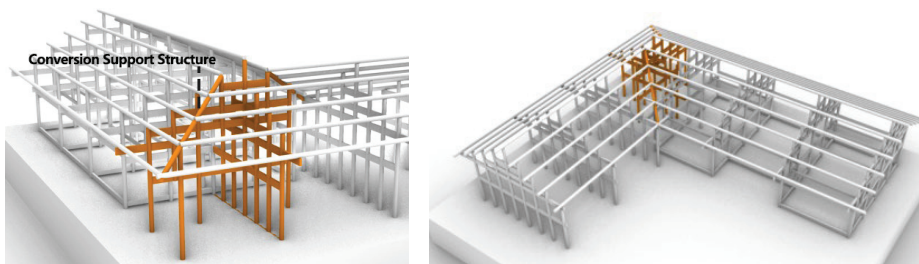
“Yaquekou” roof intersection method (different ridge heights between main house and wing rooms).
